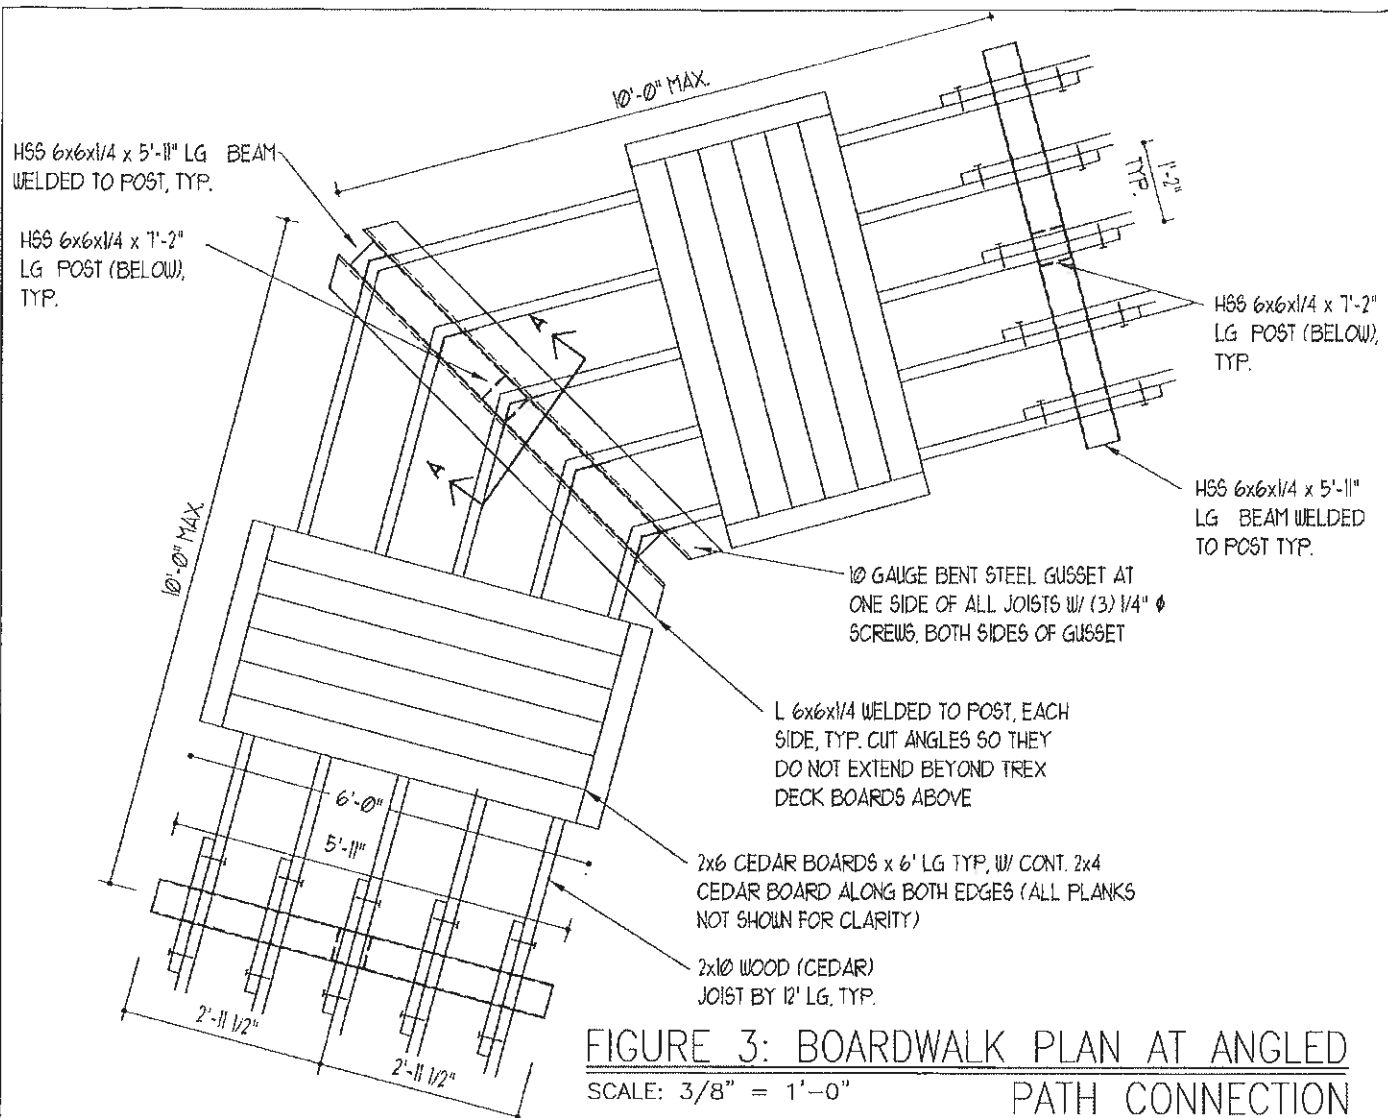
BOARDWALK PLAN AT ANGLED PATH CONNECTION
